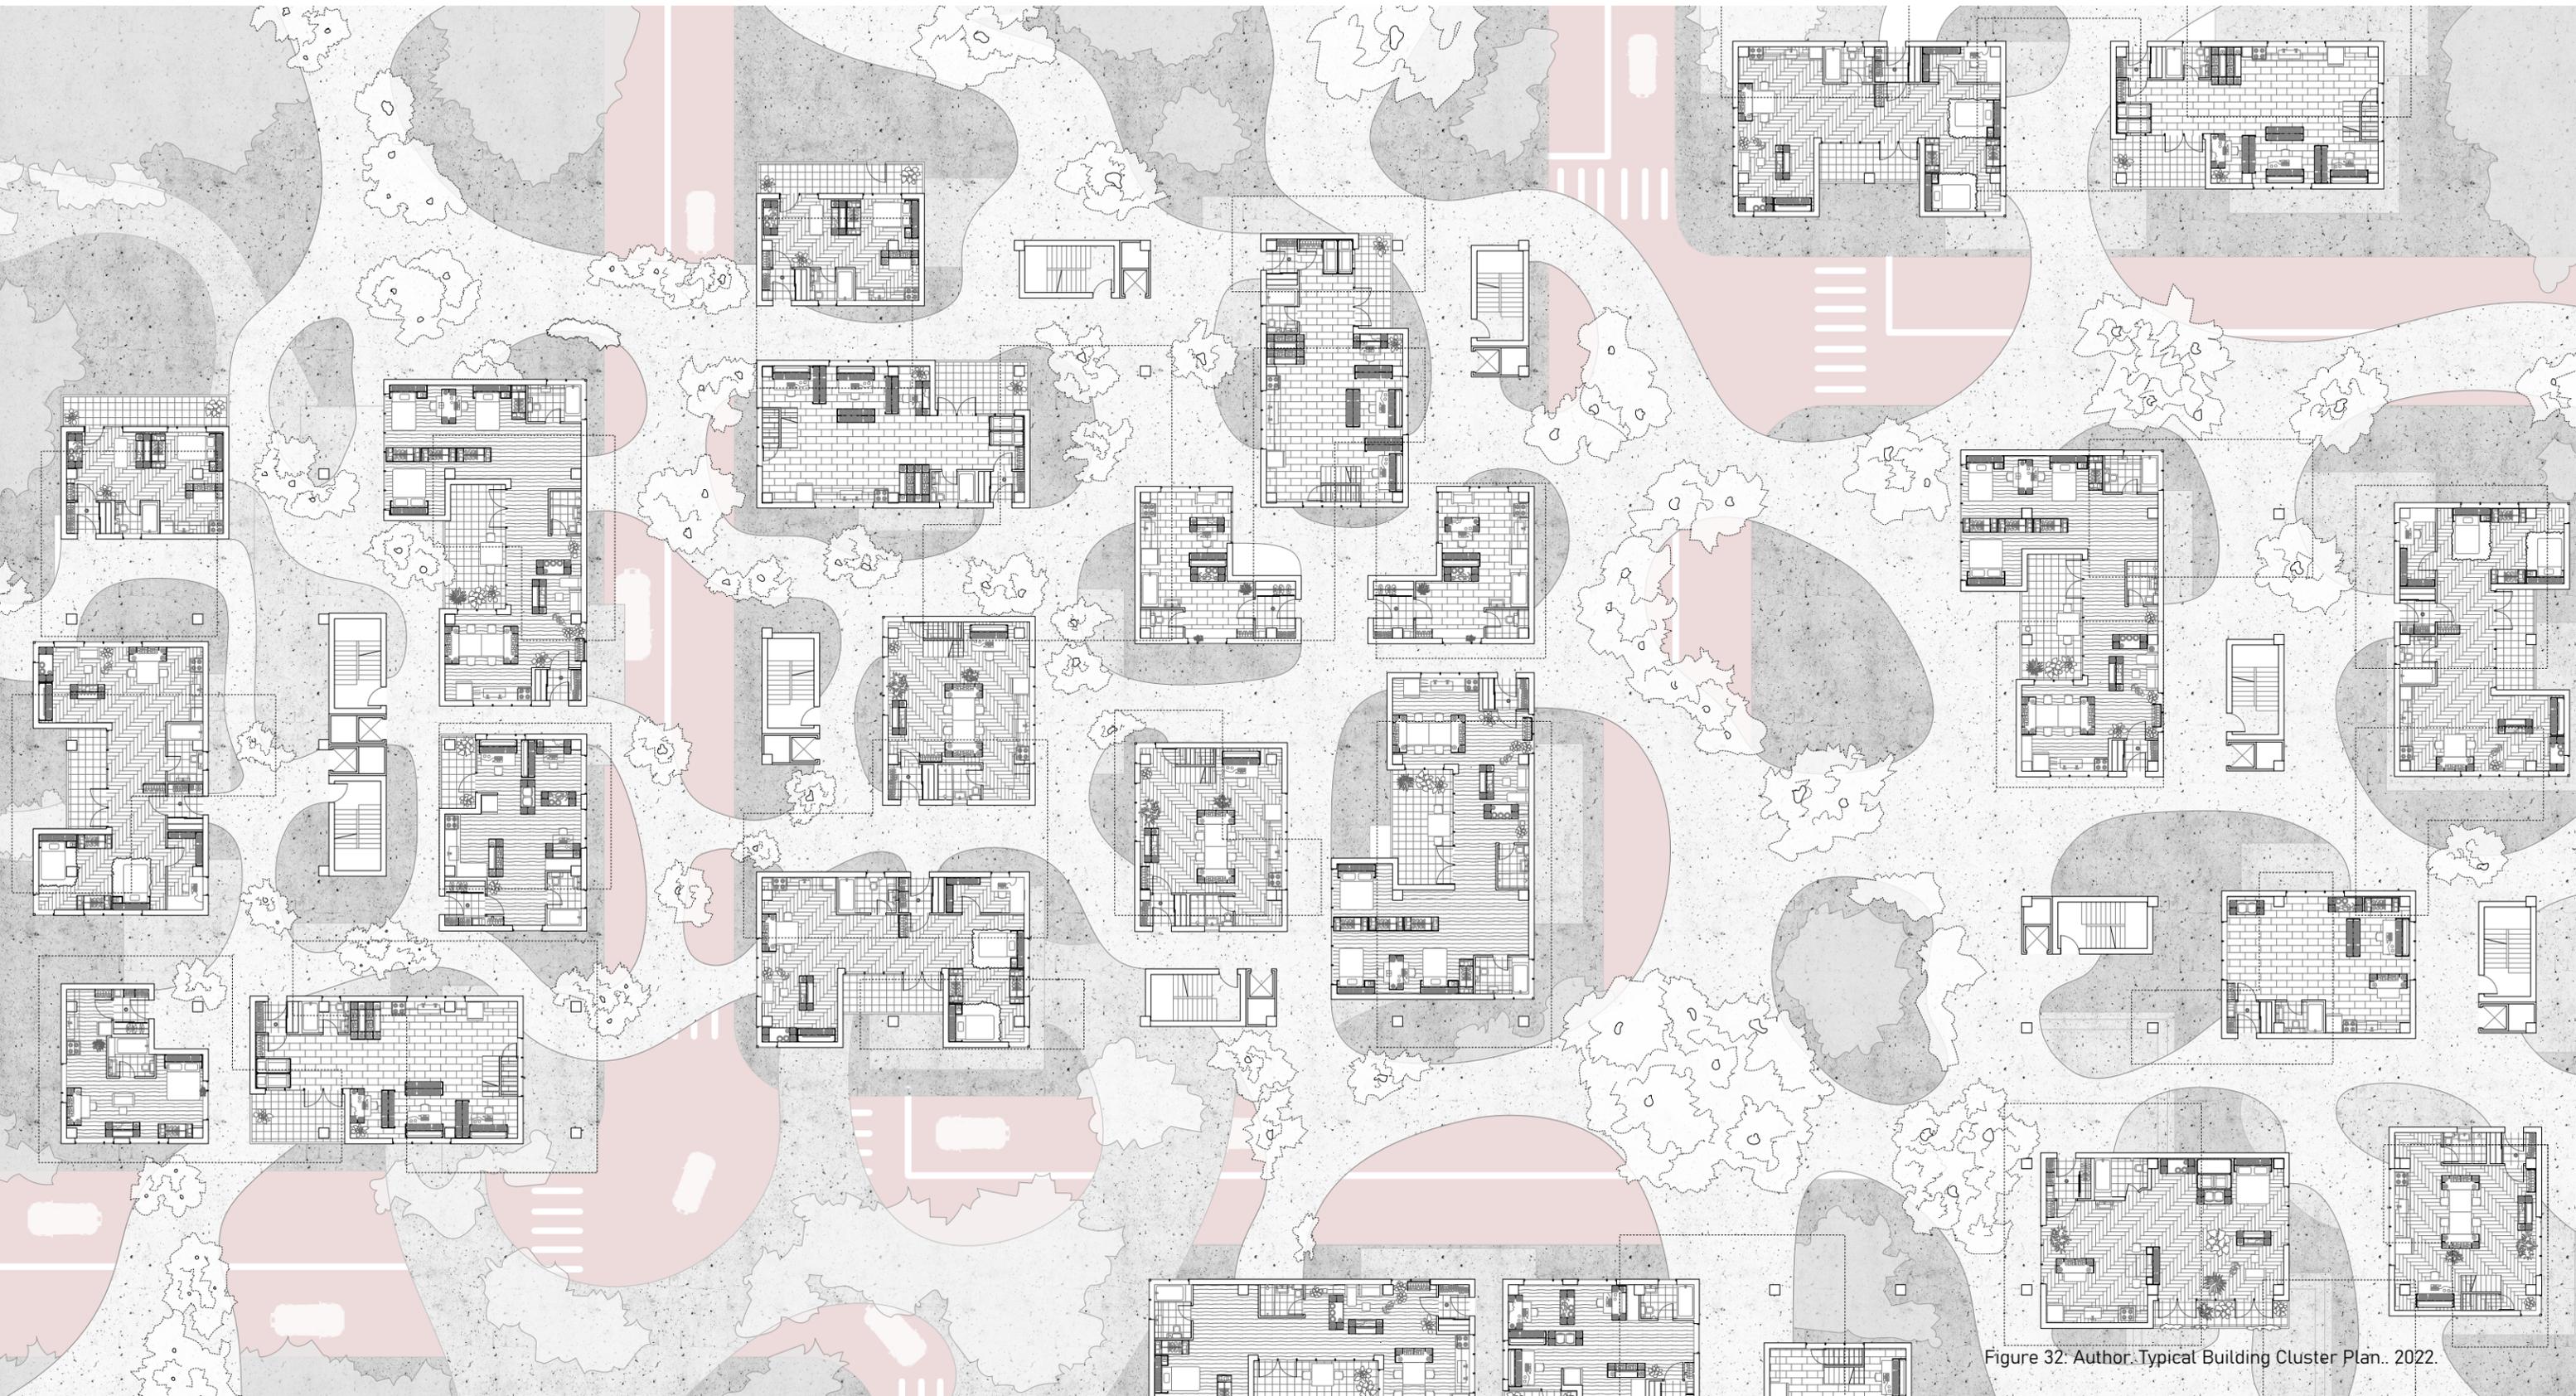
Author: Typical Building Cluster Plan.. 2022.
